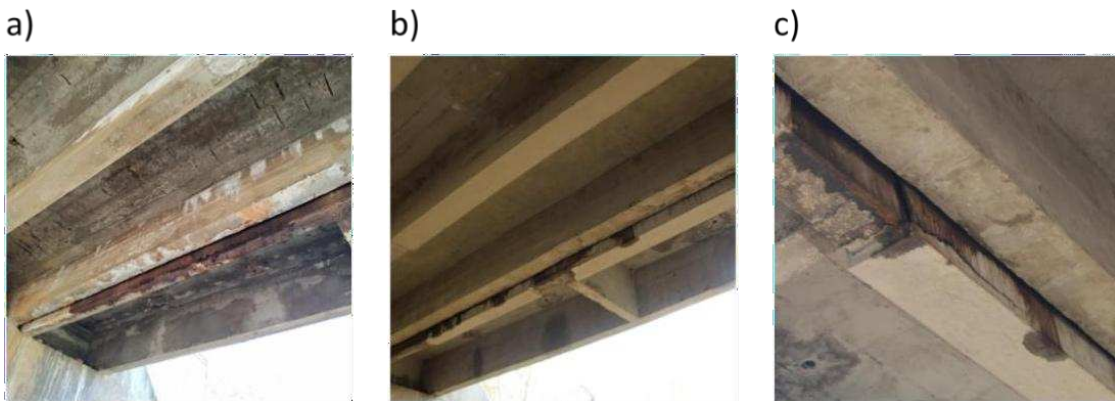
Recurring bridge damage 02 in bridge; a) Damage at 2020 inspection; b) and c) Damage at 2023 inspection
